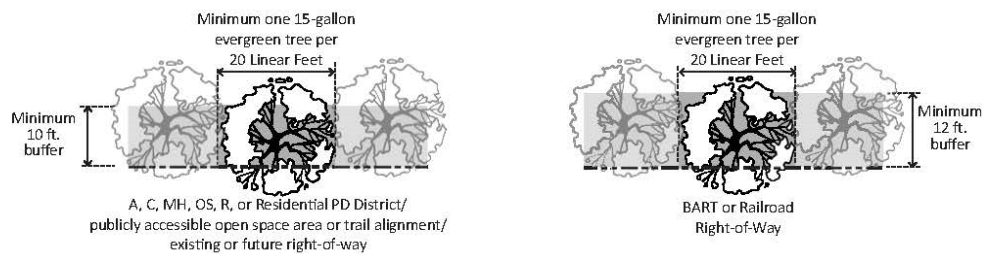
N.1.C: BUFFER AREA LANDSCAPING
